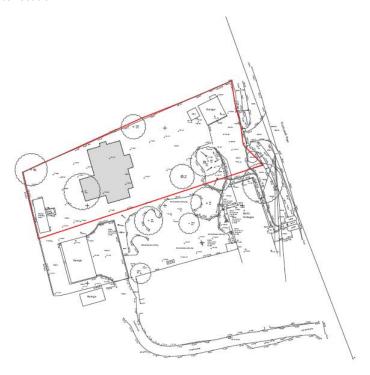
Proposed siting of dwelling with existing access onto Ecchinswell Road
